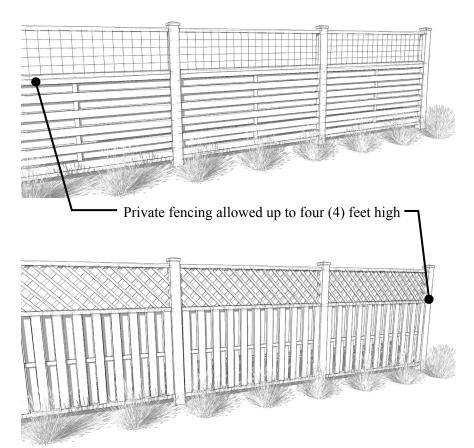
Near Open Space and Tank Farm Creek Semi-private Fencing Examples.
